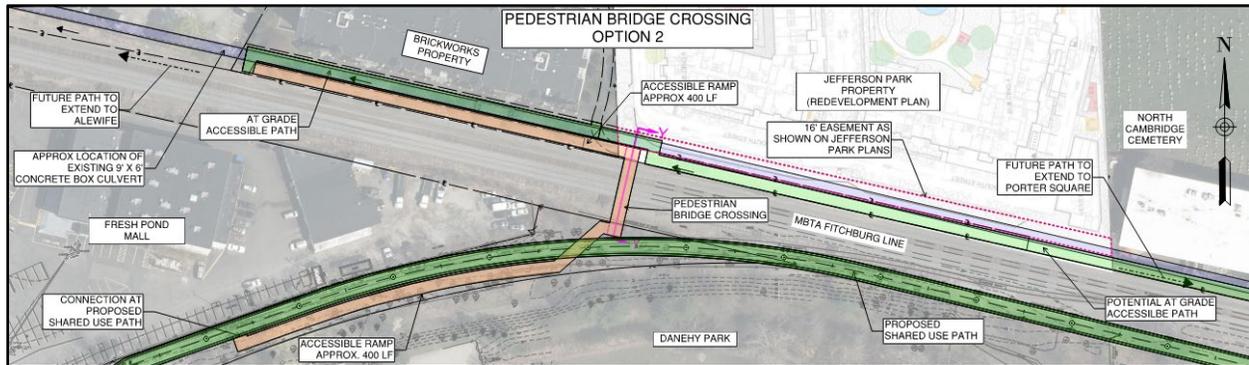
Pedestrian & Bicycle Bridge Crossing Concept 2 – Plan Diagram
